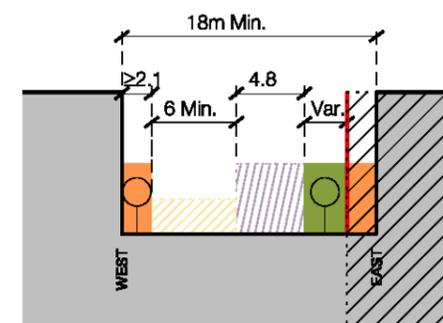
Stitching coding section: between Plot M and Hampden Road flats.
